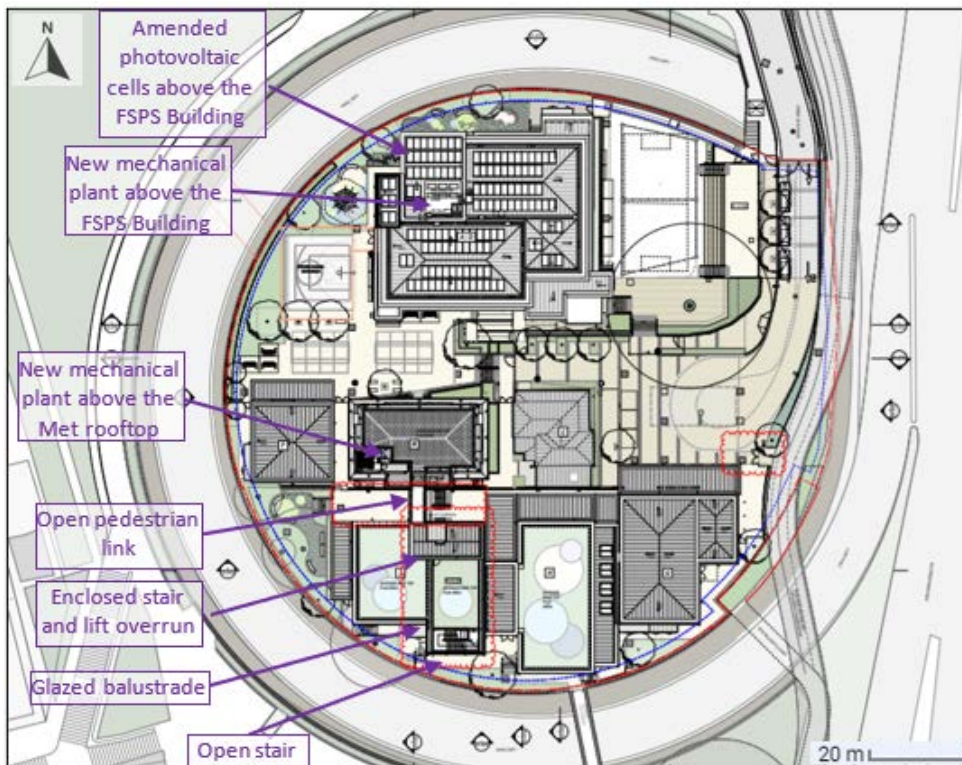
| Proposed addition to Building J (Base source: RtS 2021)
